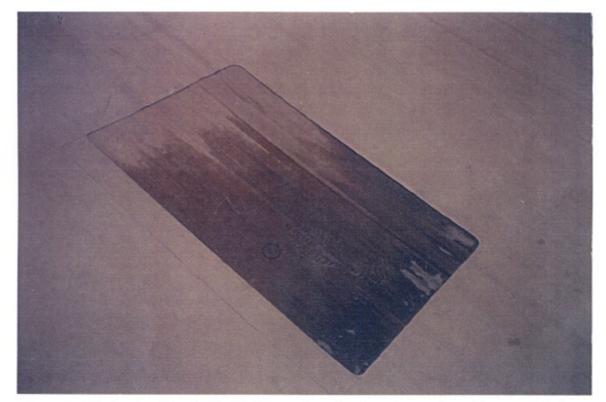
Photo showing typical test sample cutout area on a slope (note original bottom lining material which appears to be in excellent condition)
